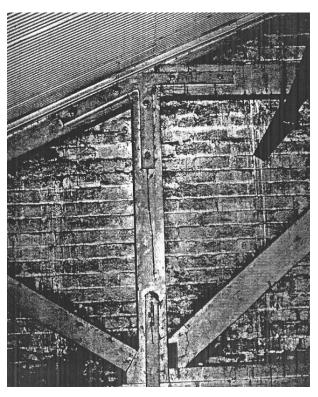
Detail of roof structure & corrugated metal interior lining, 1991
